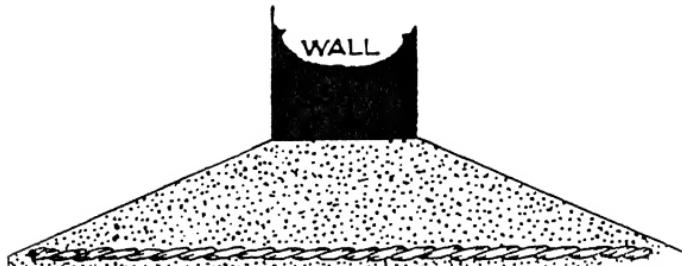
Concrete Foundation with Ransome's Twisted Iron Bars.
